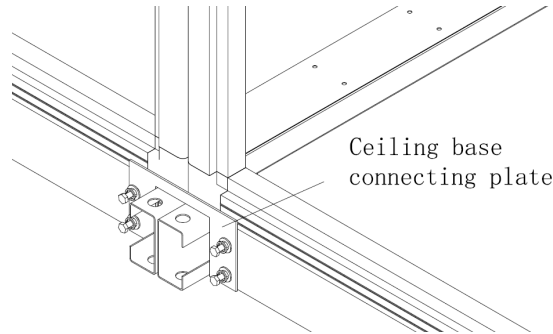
Schematic Diagram – Ceiling Base Connection
